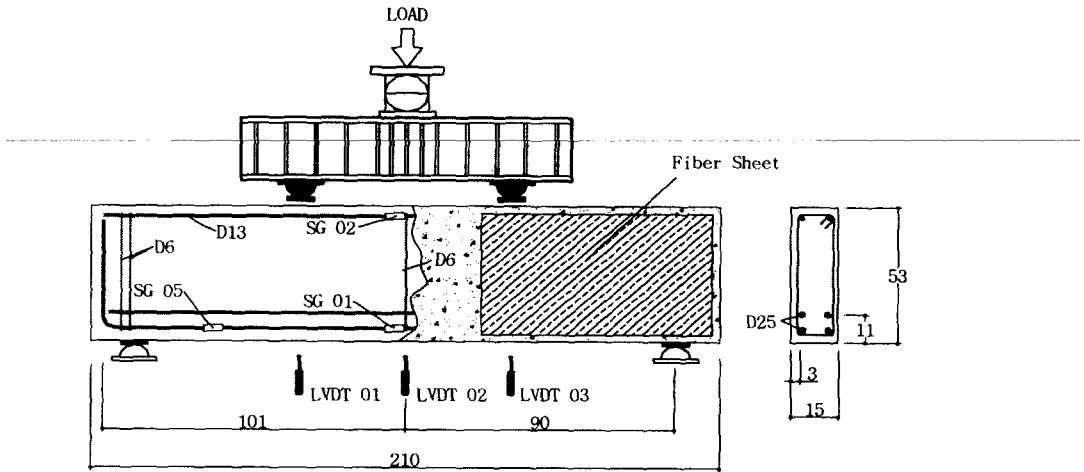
Geometrical dimension of test specimens (all dimensions in mm)
